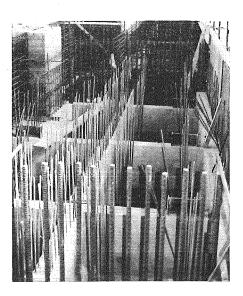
Precast Turbine-Generator Pedestal Construction
